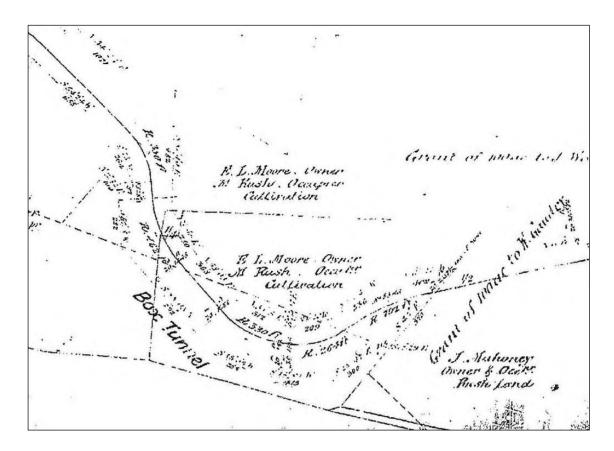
Detail of an 1892 plan, showing part of Portion 2 of the Parish of Minto (source: LPMA Crown Plan 923.3000).
